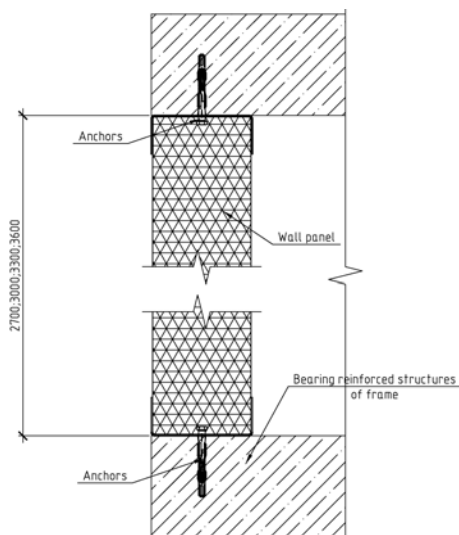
Scheme of fastening wall panel to load-bearing constructions of the building frame
